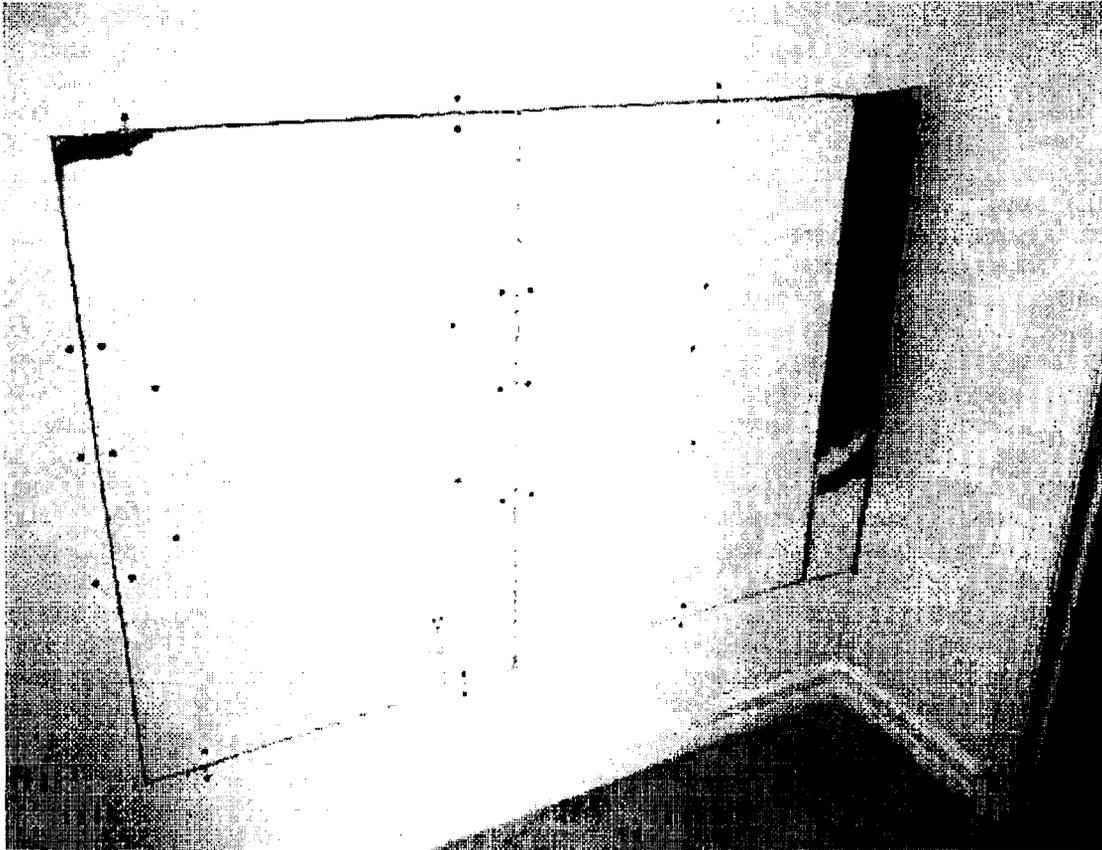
shows the wall that the builder used to sample drywall. Additional drywall was added to cover the hole.
